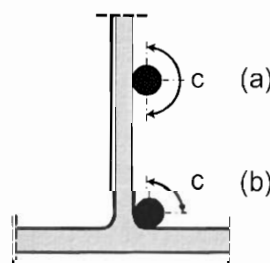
Effective perimeter  $c$  of a reinforcing bar
